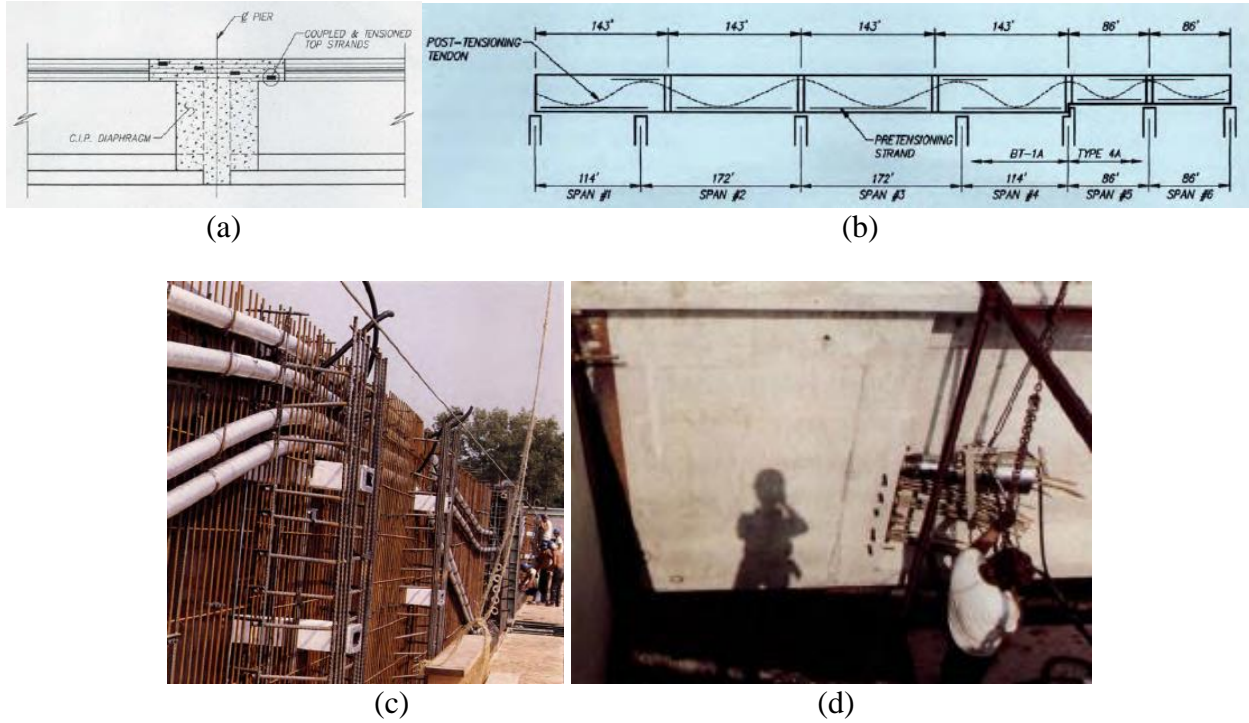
Splice of prestressed concrete girders: (a) overpass splice joint (Ficenec et al. 1993); (b) post-tensioning scheme (Ficenec et al. 1993); (c) tendon layout (Caroland et al. 1992); (d) post-tensioning through girder end block (Caroland et al. 1992)
